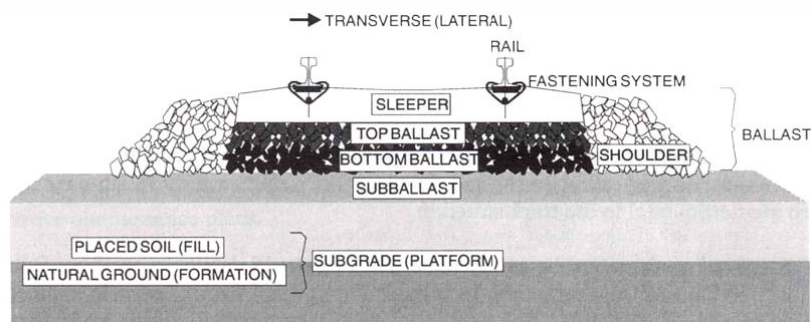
Track layout of a typical ballasted track – cross section (Selig and Waters, 1994).
